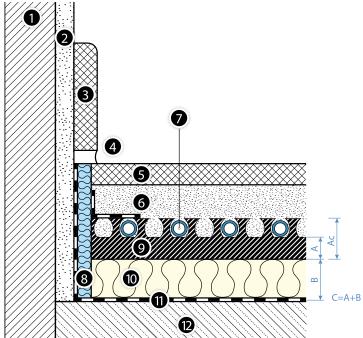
Floor heater with KAN-therm Profil system board and supplementary insulation and dampproof coating on the ceiling laid out on the ground.
